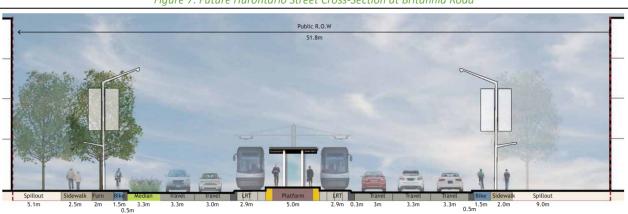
Future Hurontario Street Cross-Section at Britannia Road
